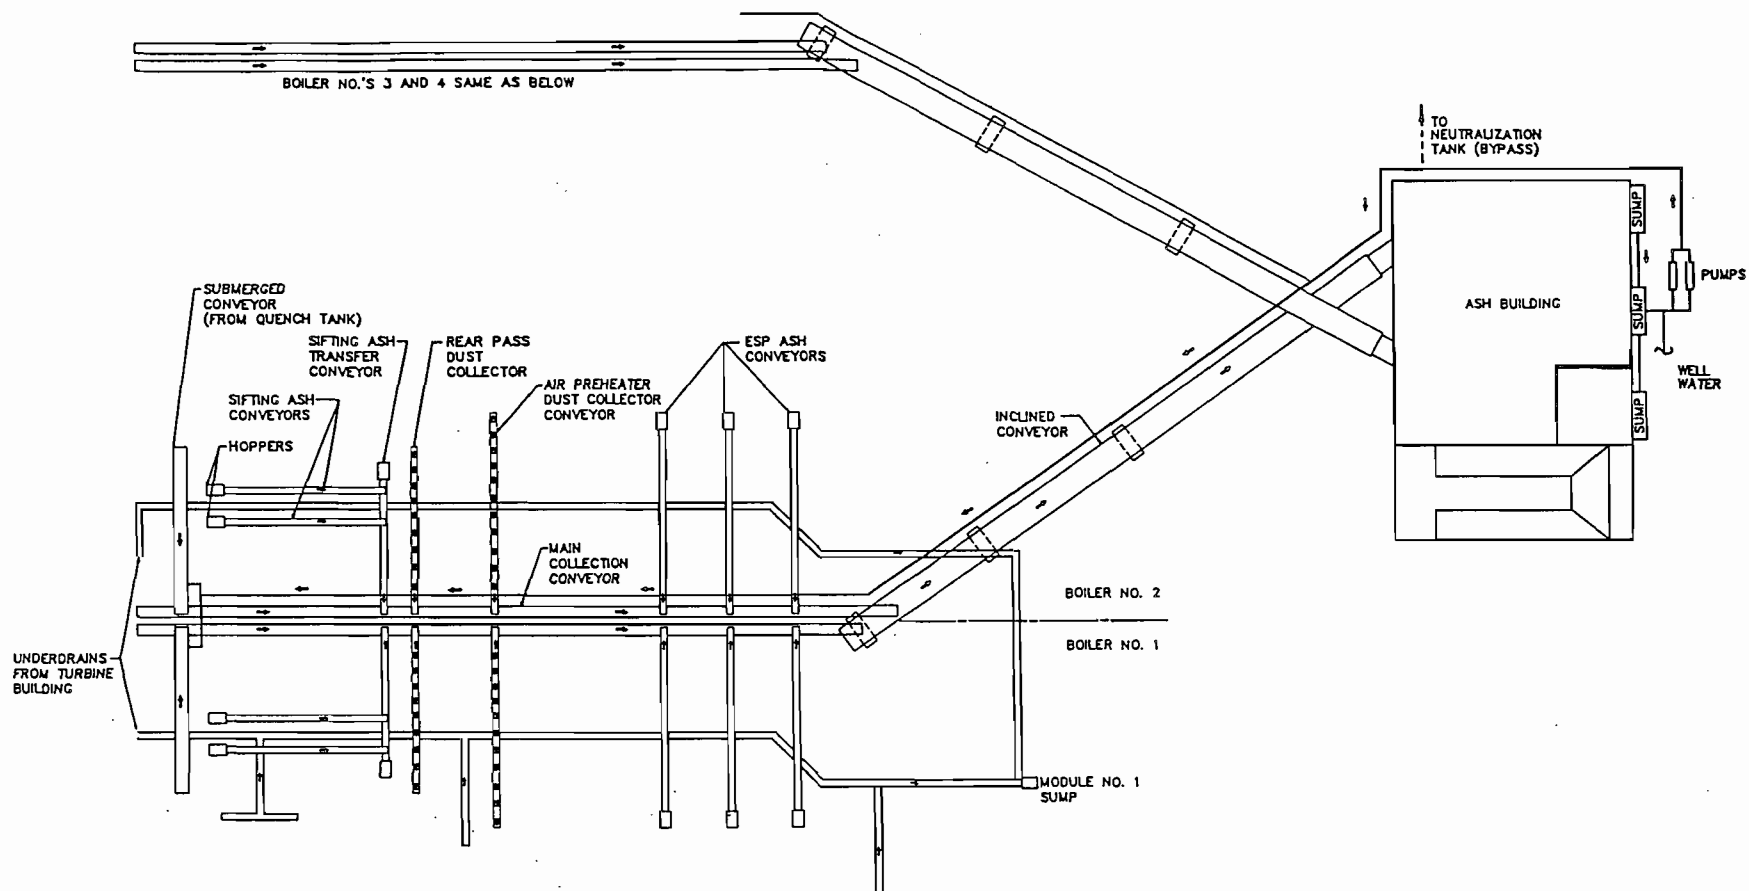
DCRRF ASH HANDLING SYSTEM PLAN VIEW
